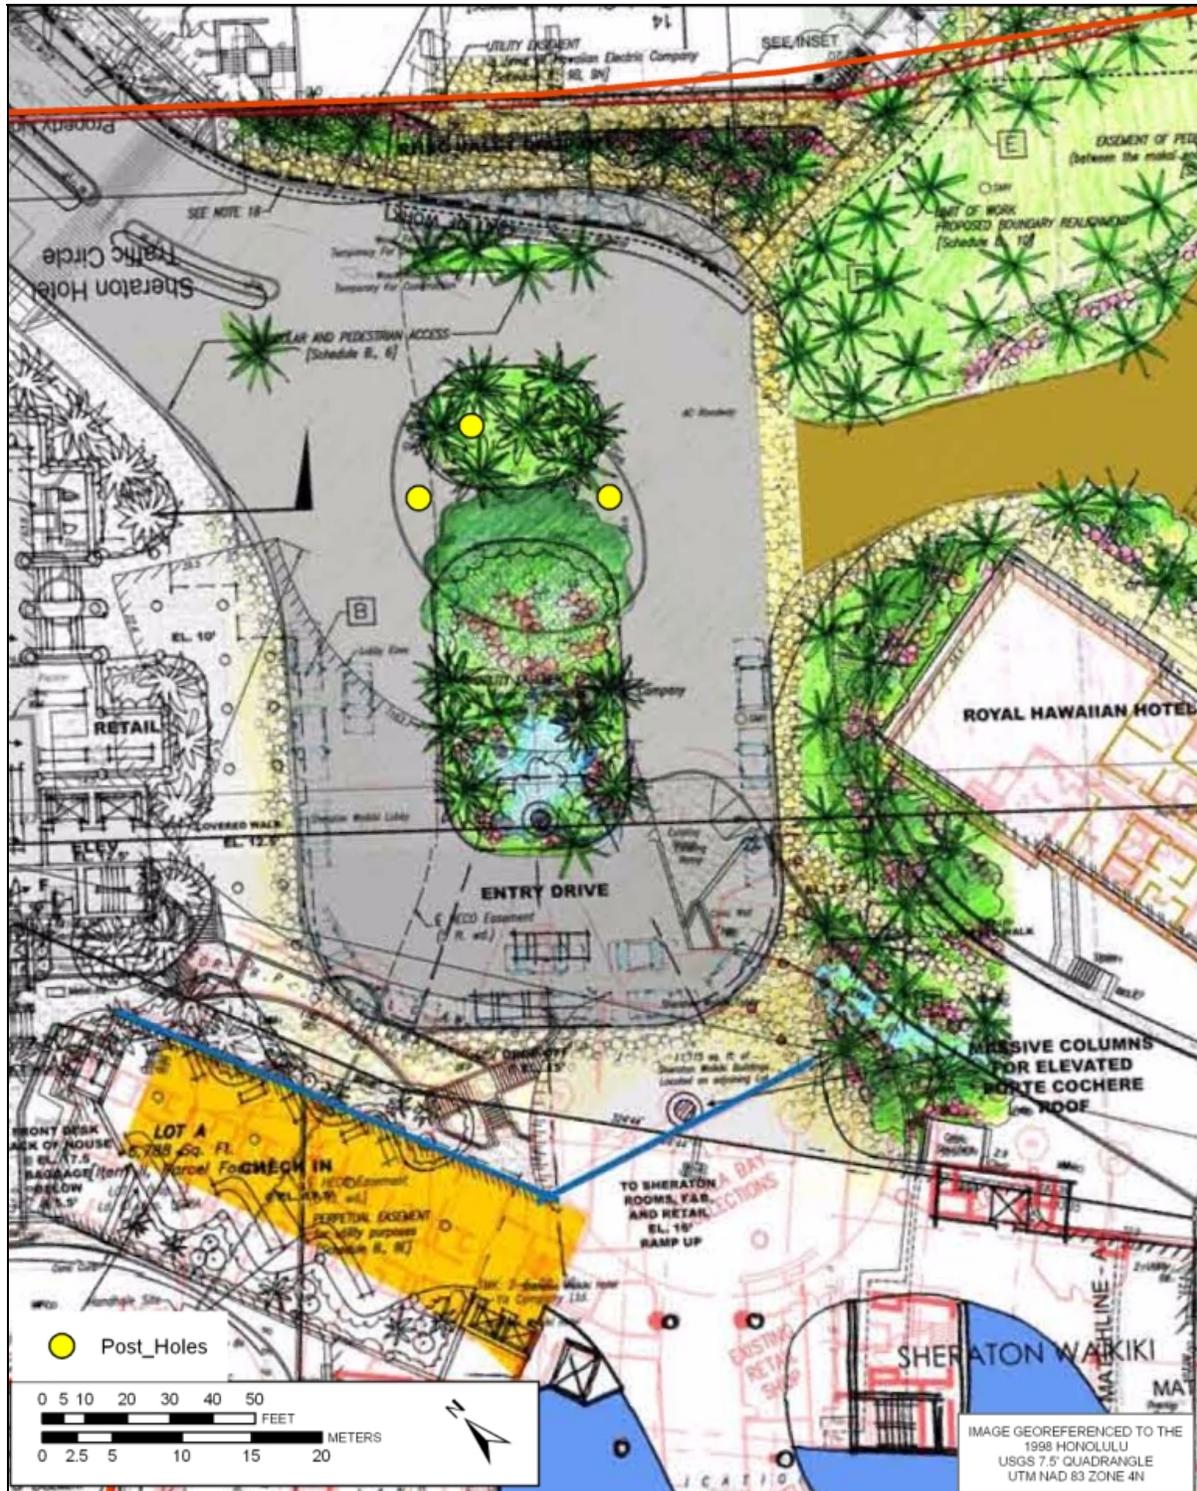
Portion of Renovation plans for the North Royal Hawaiian Hotel area of work. Archaeological inventory survey testing is proposed for the north area of the existing traffic island that will become asphalt driveway
